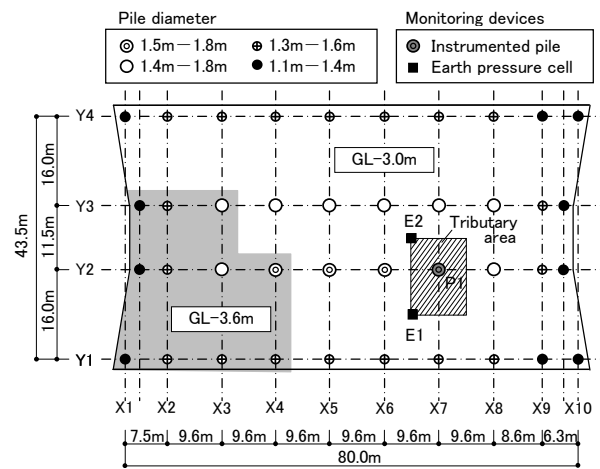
Foundation plan with layout of piles (Yamashita et al., 2011a)
